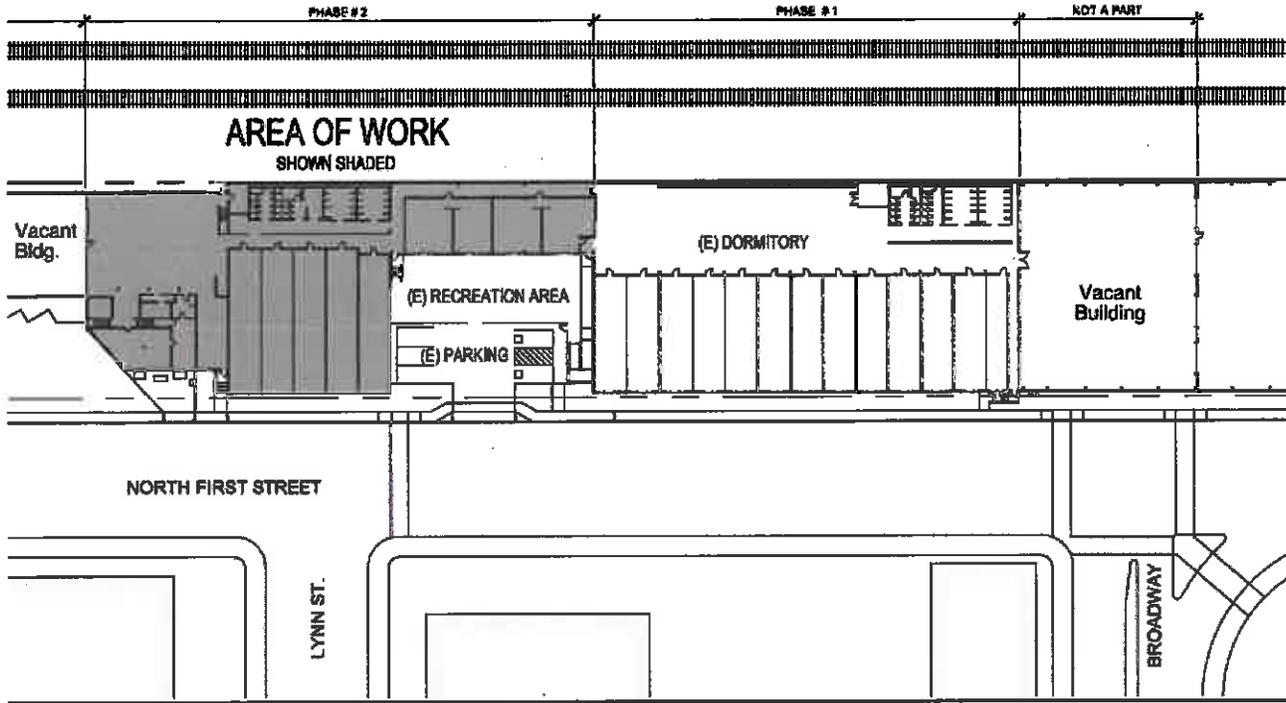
Plot Plan of Building Remodel and Existing Dormitory, 218 First St.
